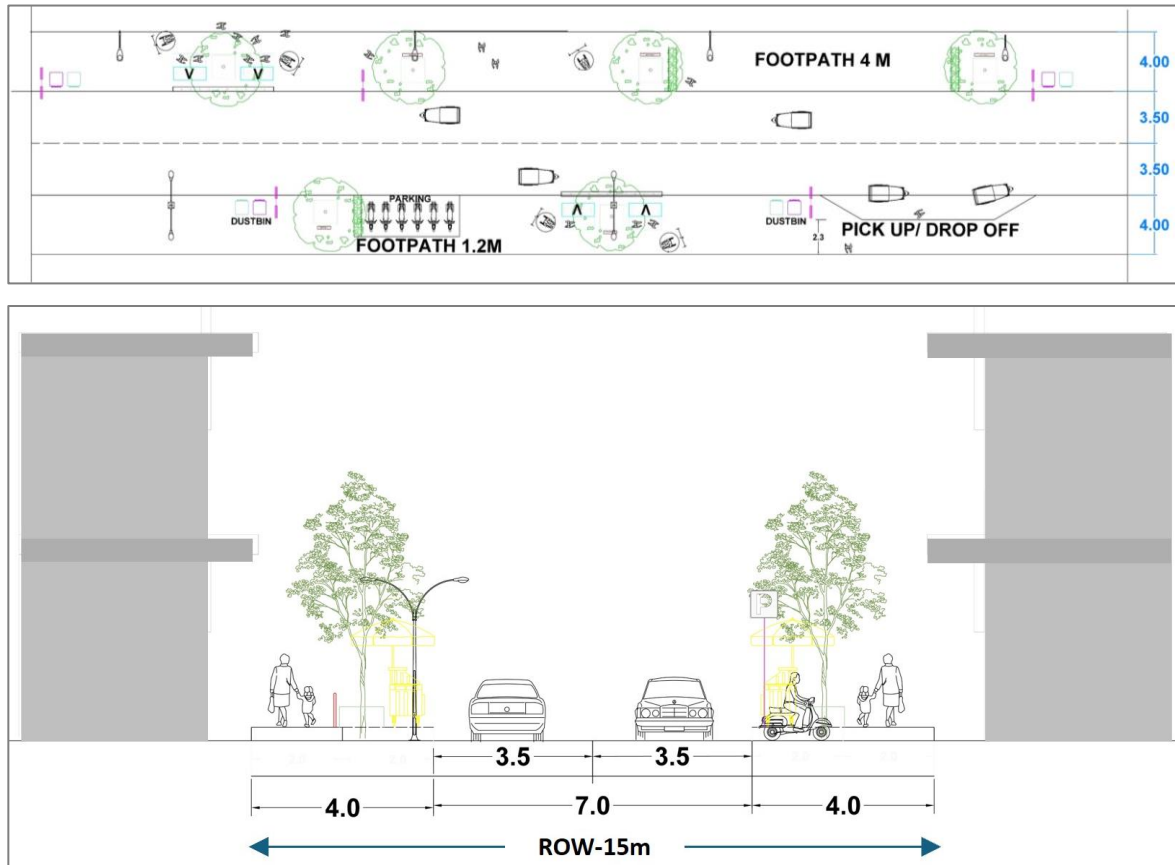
Proposed Zero emission zone (NMT Stretch) plan & cross-section
